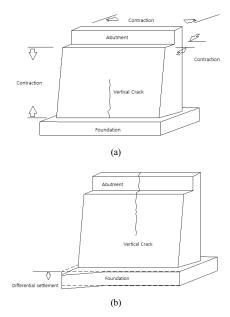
Examples of Possible Cracks in Concrete Bridge:
